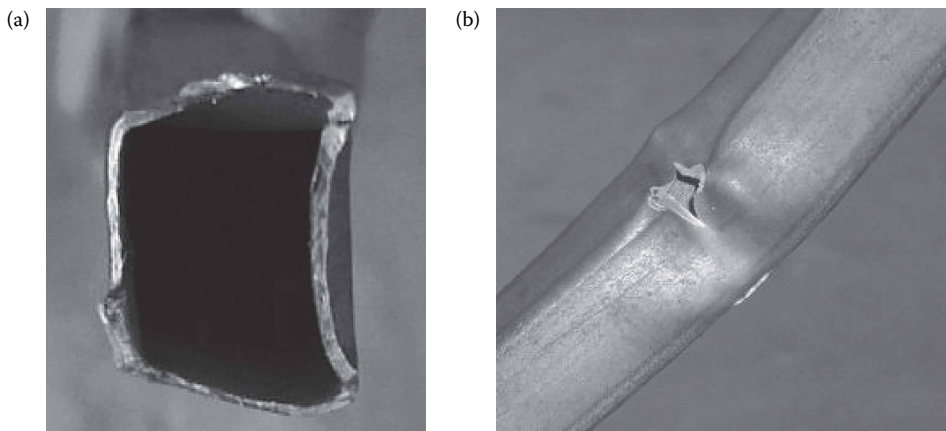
Fracture of tubular steel bracing member during shake table testing. (a) Failure of tubular bracing member. (b) View of fracture during testing.
